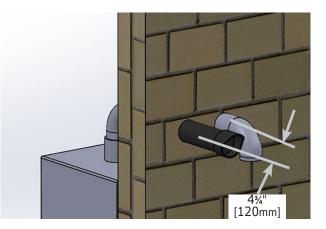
Twin Pipe Side Wall with 45° Vent
